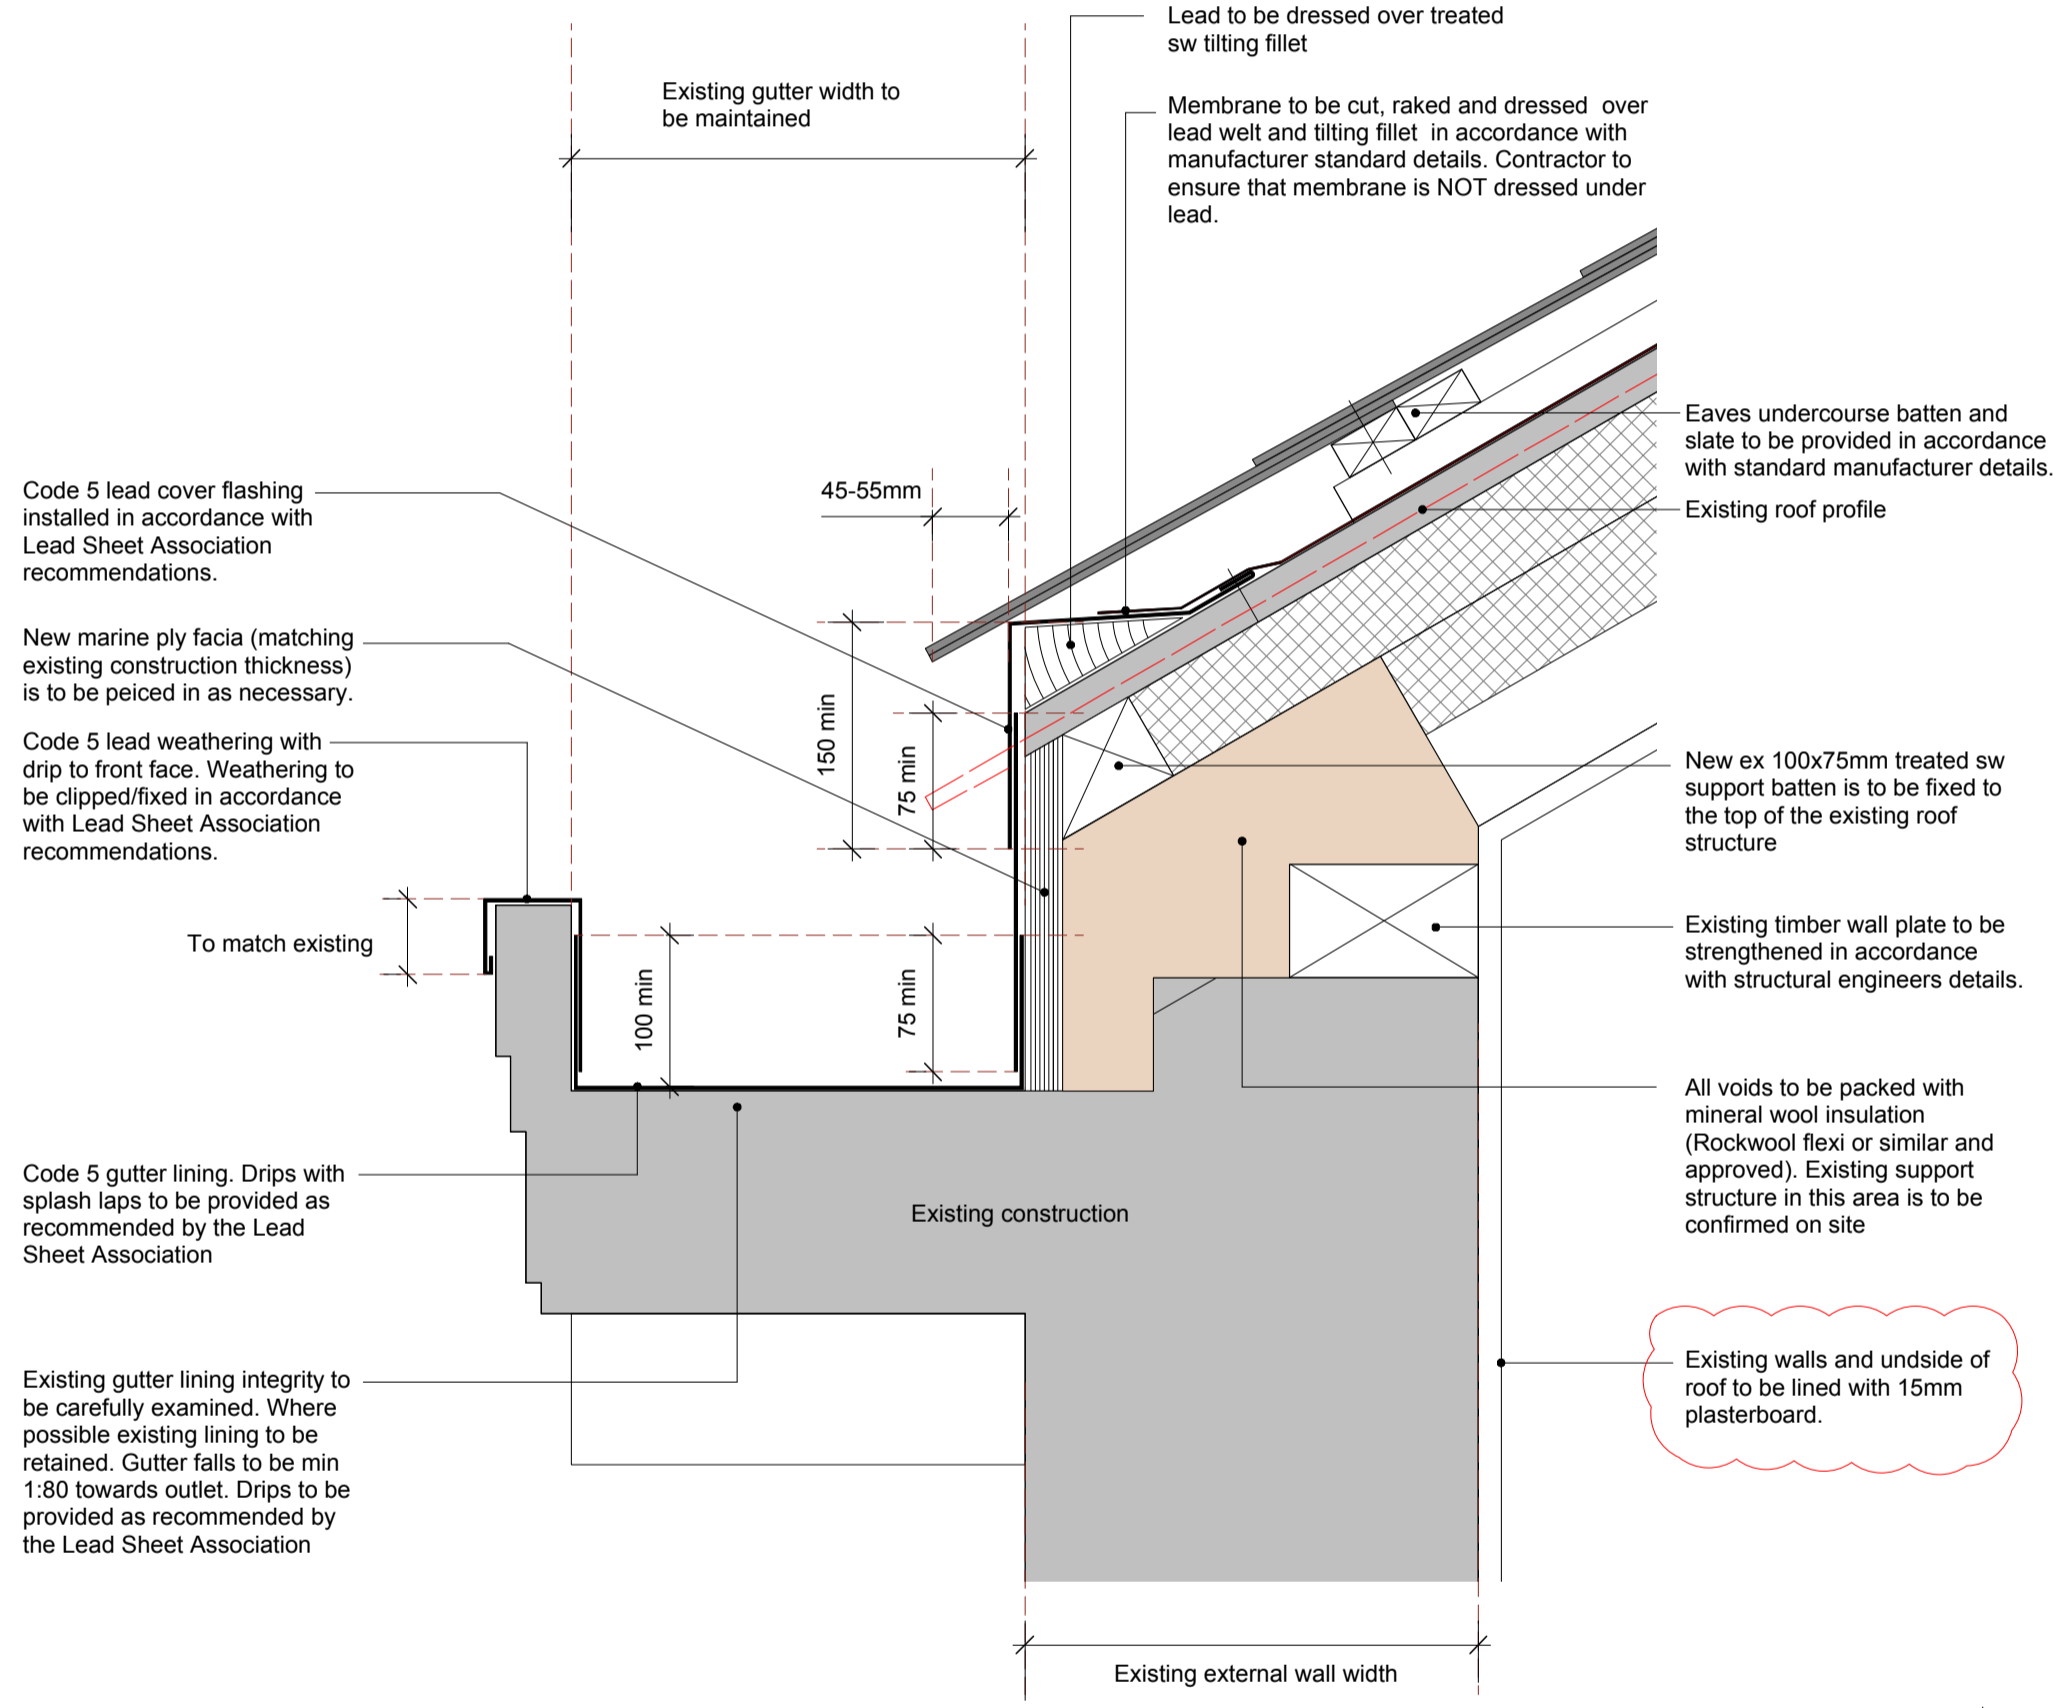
Drainage Detail at Perimeter Kerb (1:5 @ A1)
